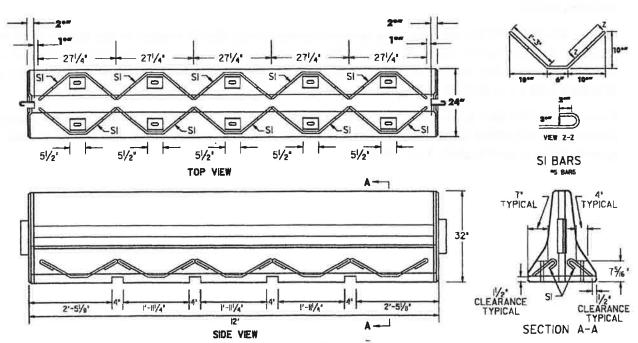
Anchor reinforcement for JJ-Hooks connection – South Carolina Source: South Carolina DOT 605-205-02
